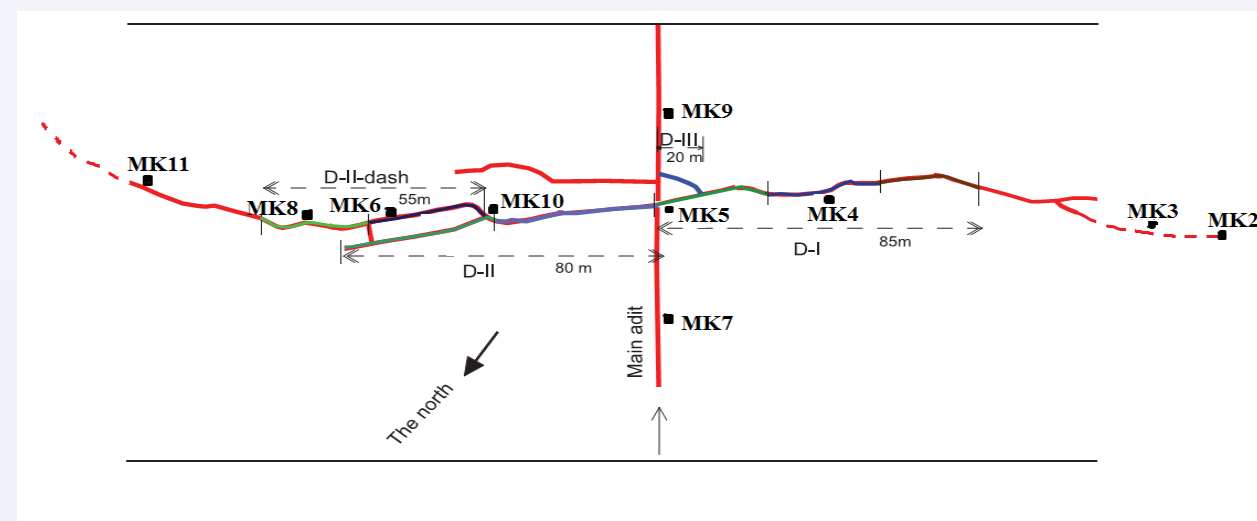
Plan of El-Missikat mining work (Abu Deif, 1985)
